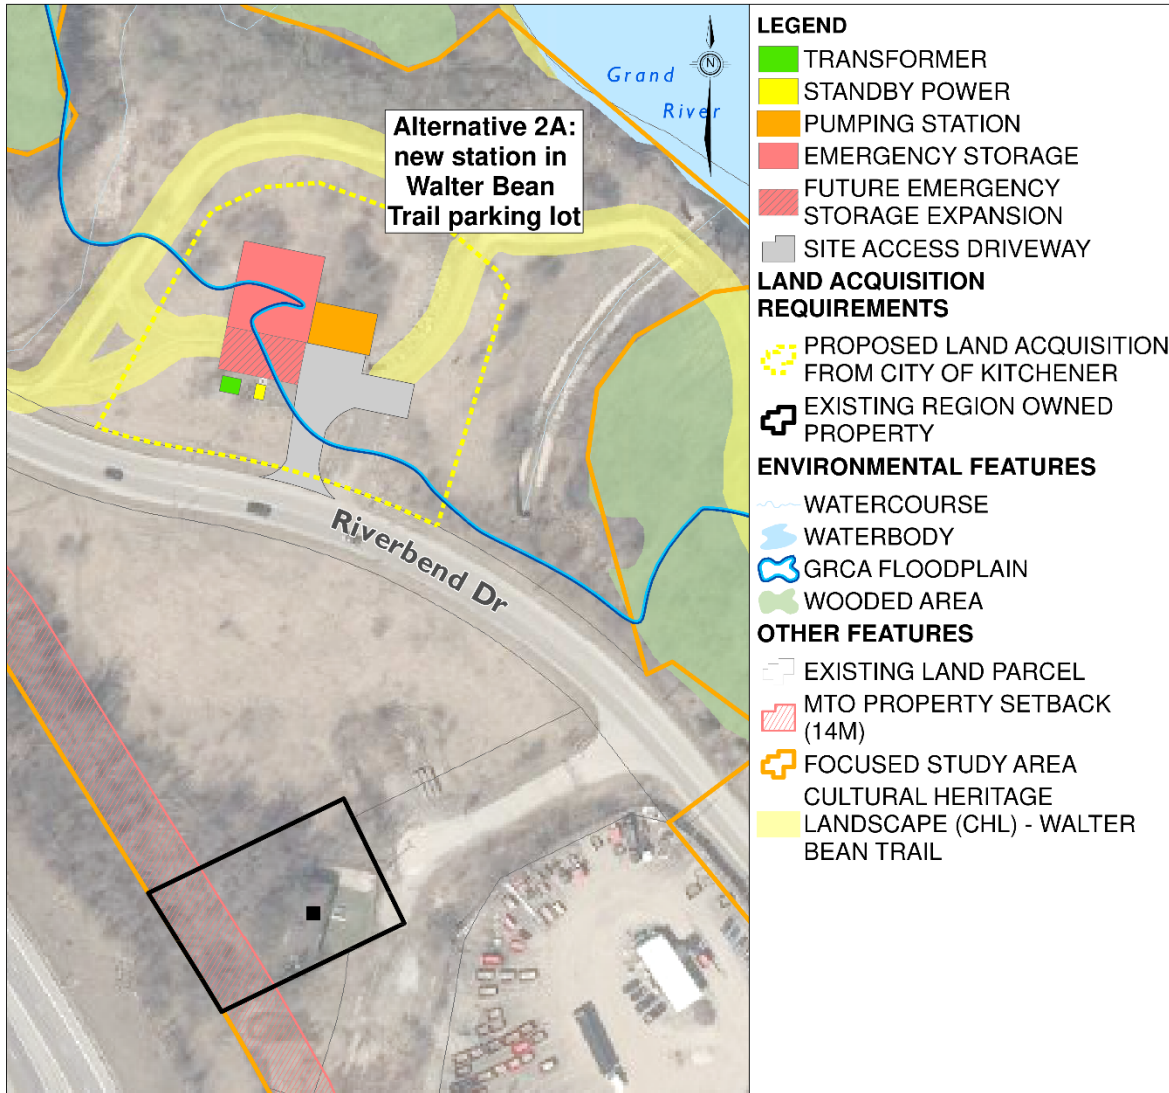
Alternative 2A - New Station in Walter Bean Trail Parking Lot
